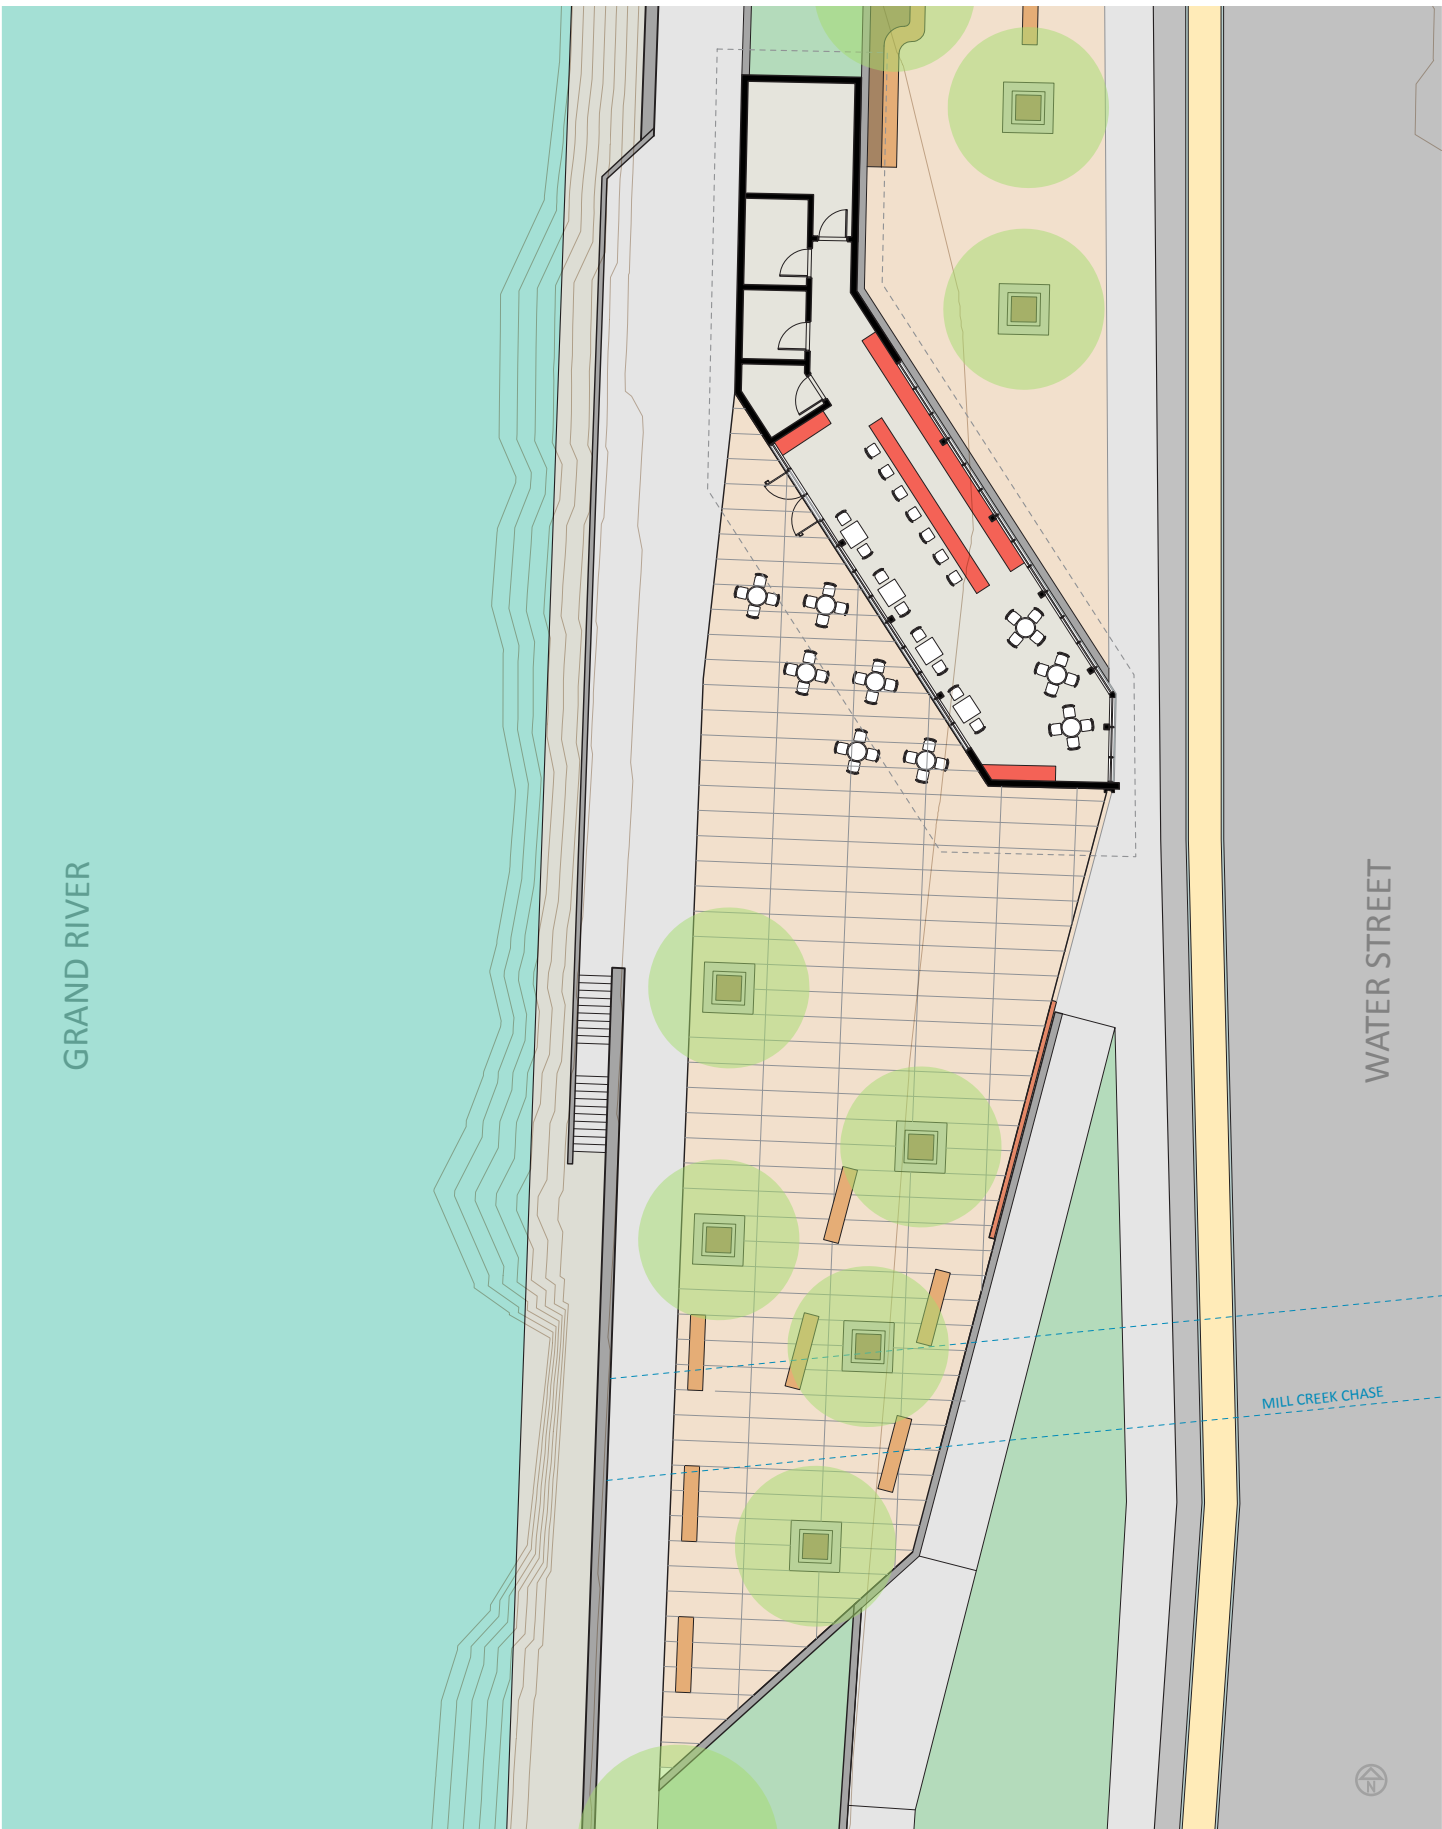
Interior plan of the Promenade Cafe (1:300).
